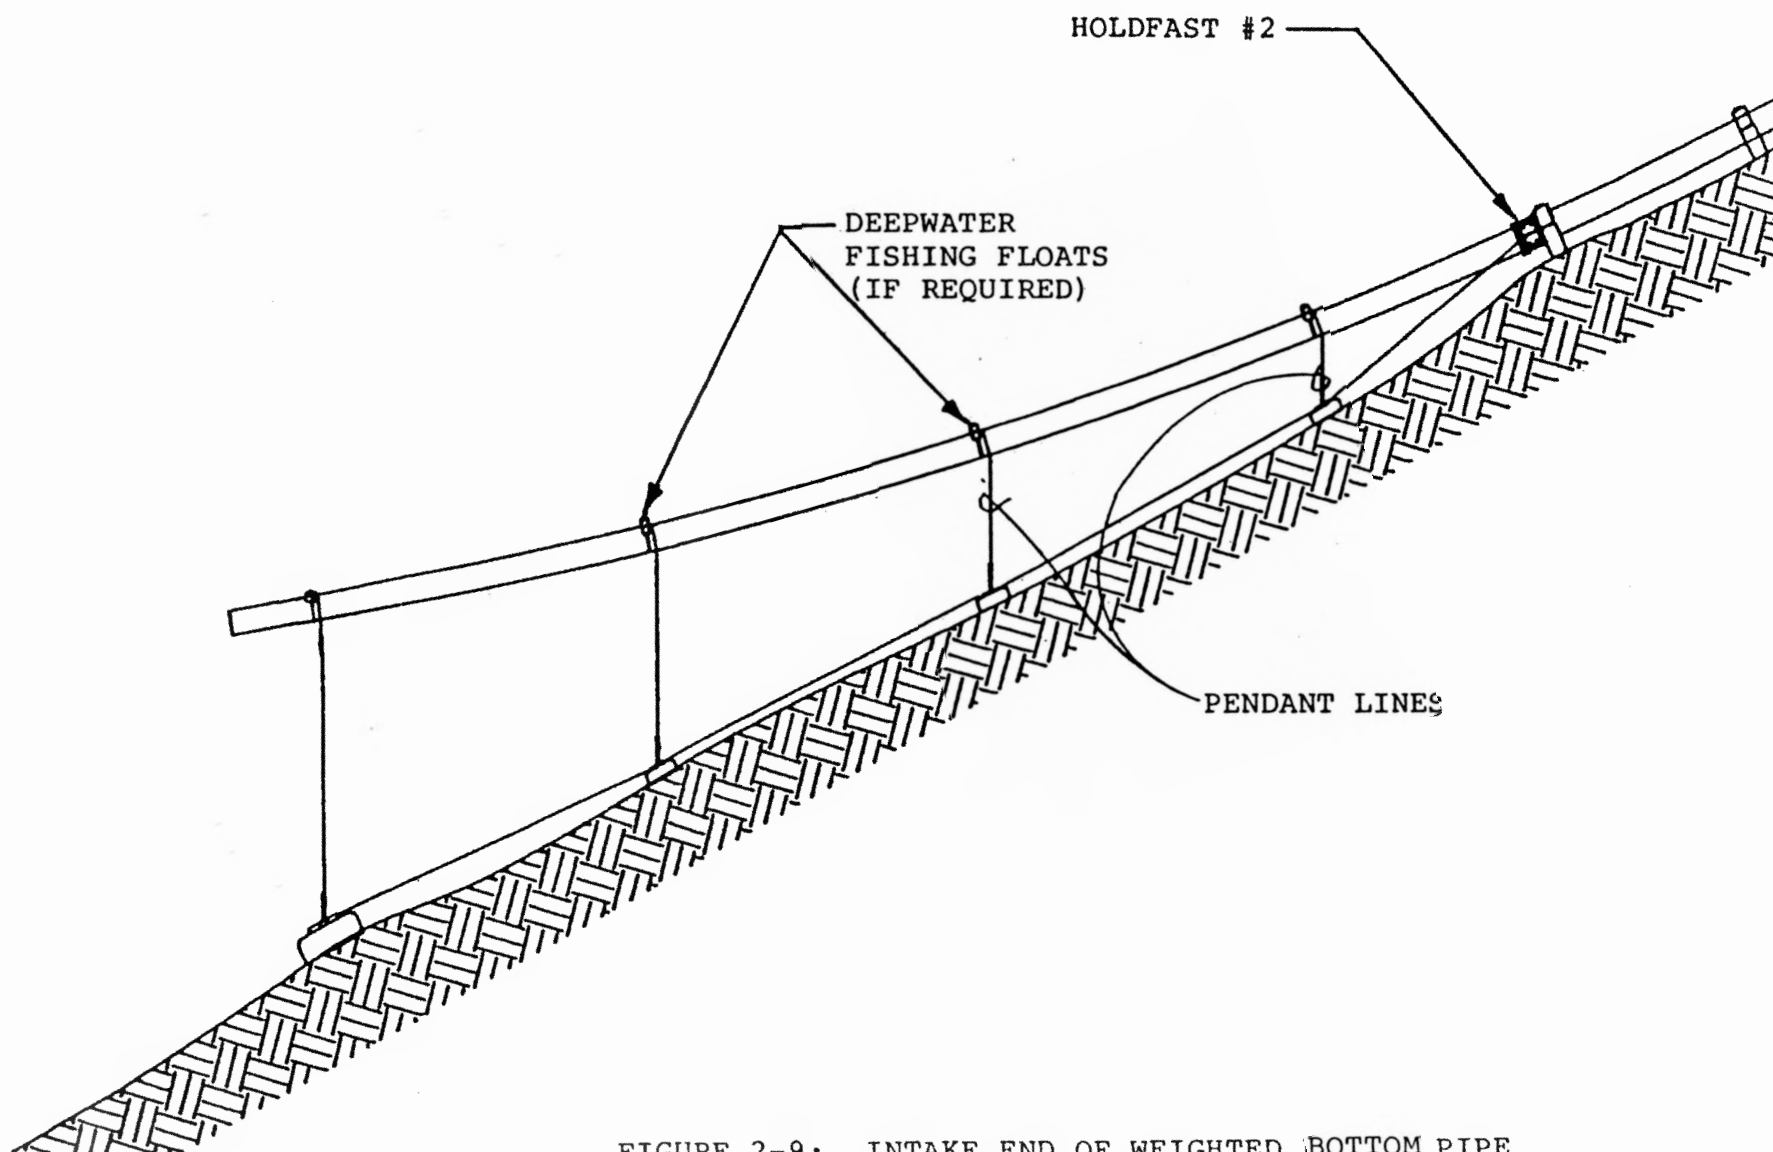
INTAKE END OF WEIGHTED BOTTOM PIPE
